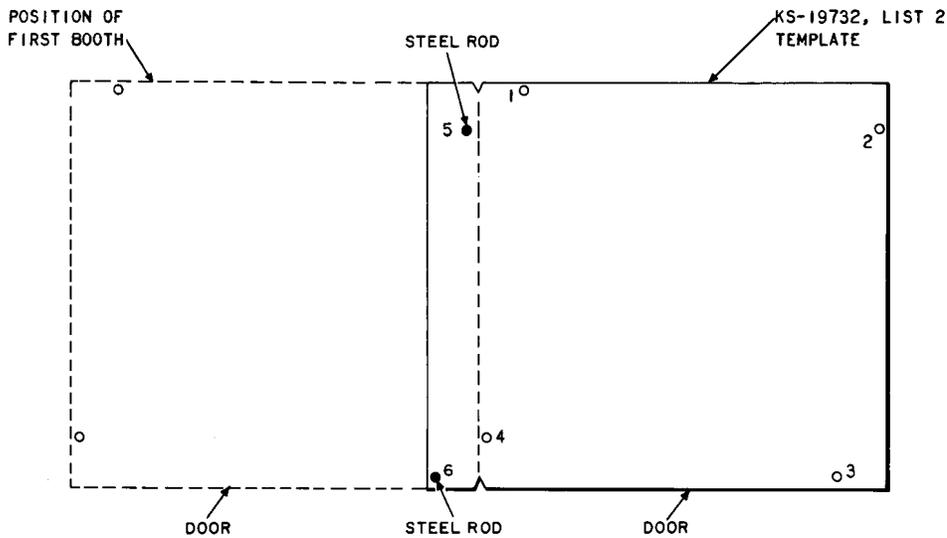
Left to Right Layout for Drilling Mounting Holes
